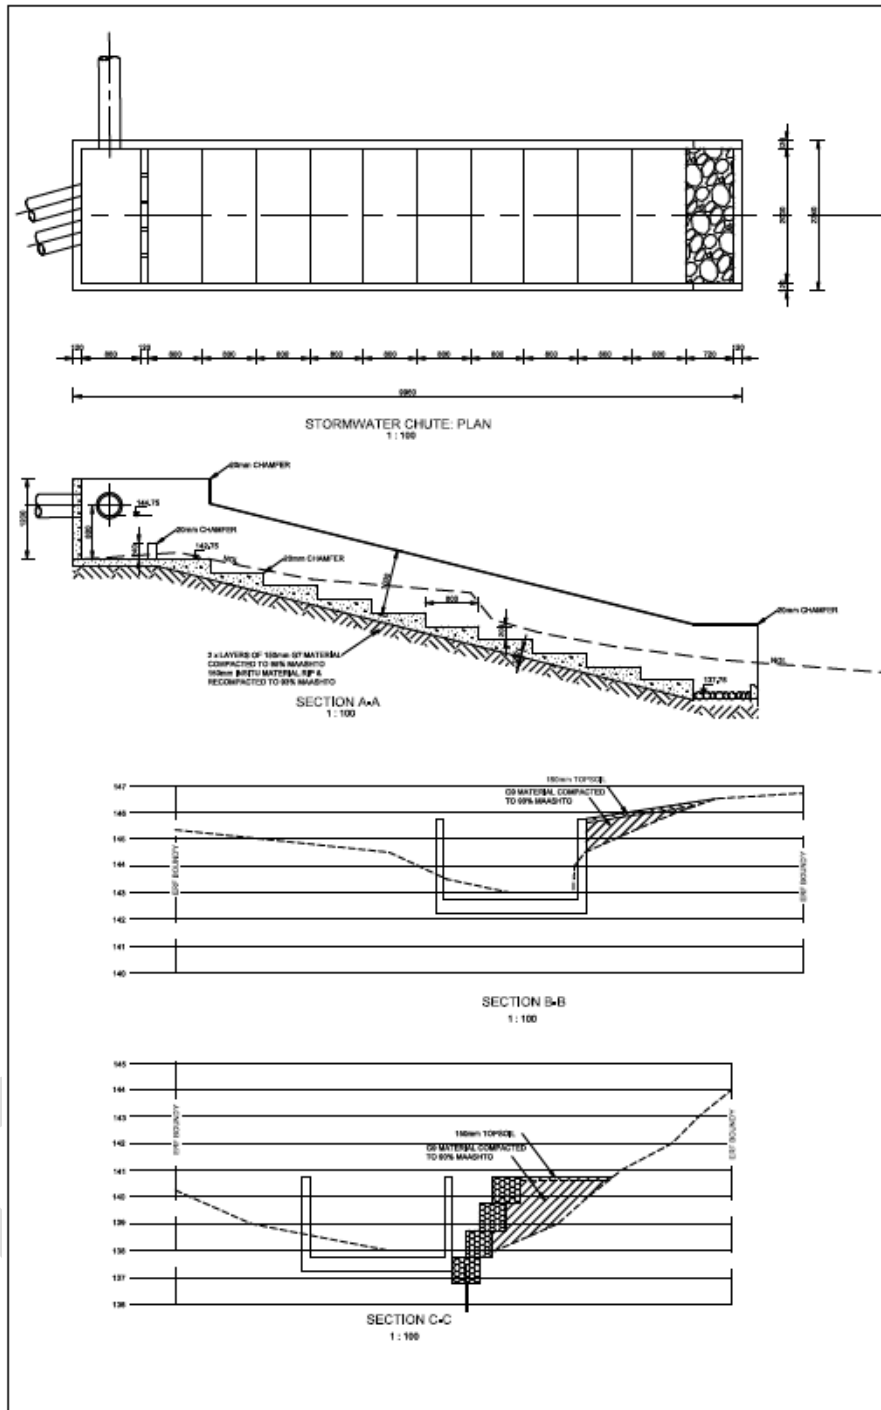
Plan and section drawings of the proposed stormwater chute, stilling basin and stabilisation of the embankment.
